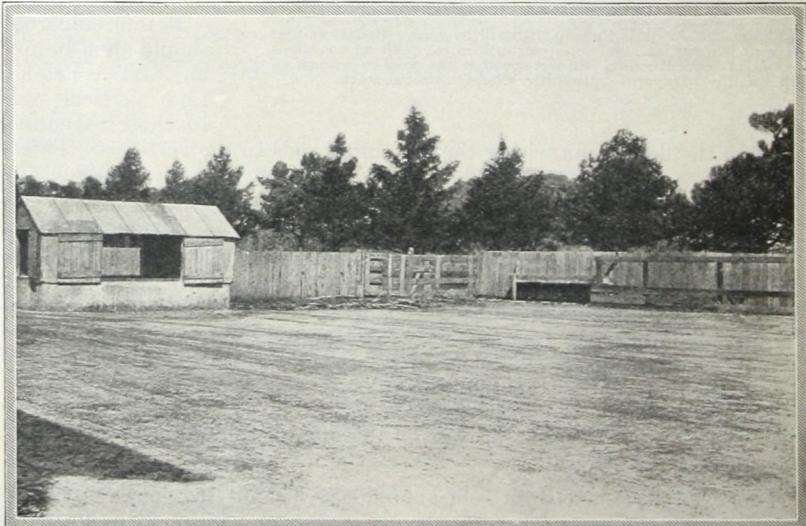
Concrete barnyard pavement and stock tank on the Ed. Harvey farm, La Fox, Illinois. A permanent improvement which will yield big returns in saving of feed and labor, not to mention the sanitary advantages.
